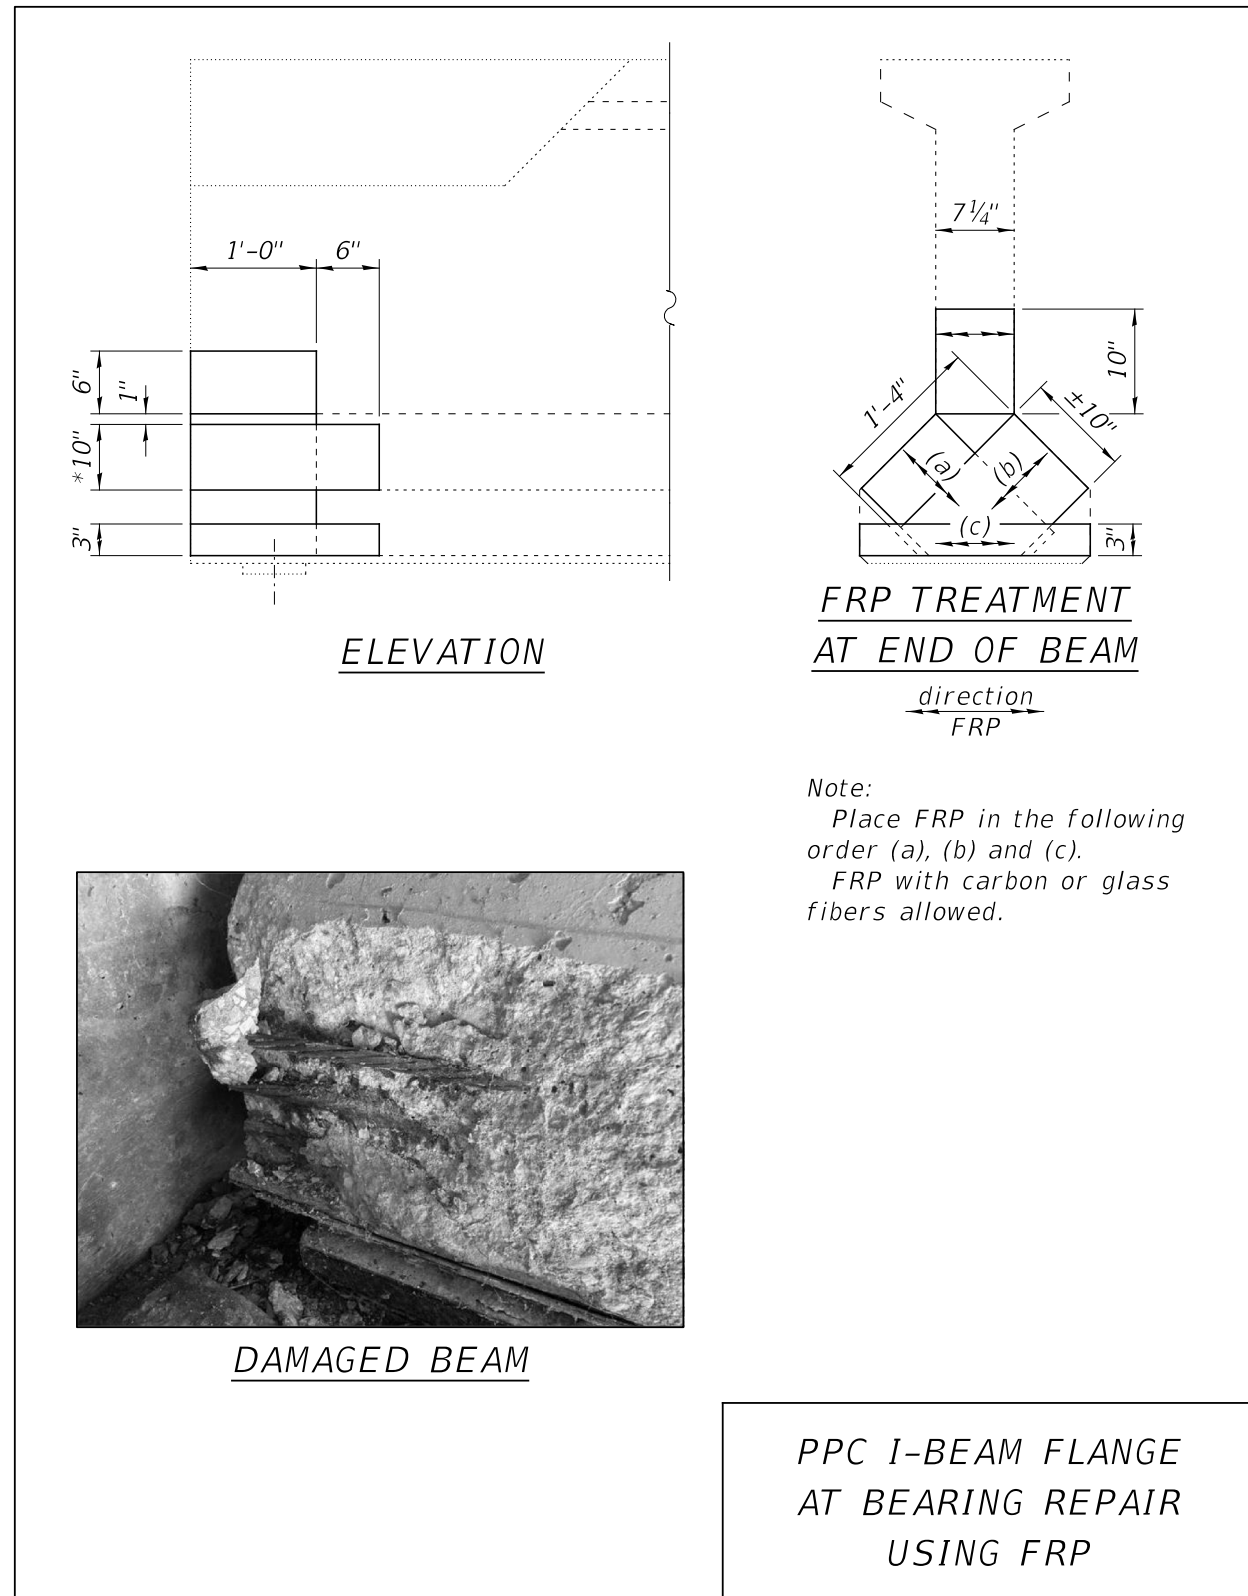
PPC I-Beam Flange at Bearing Repair Using FRP
